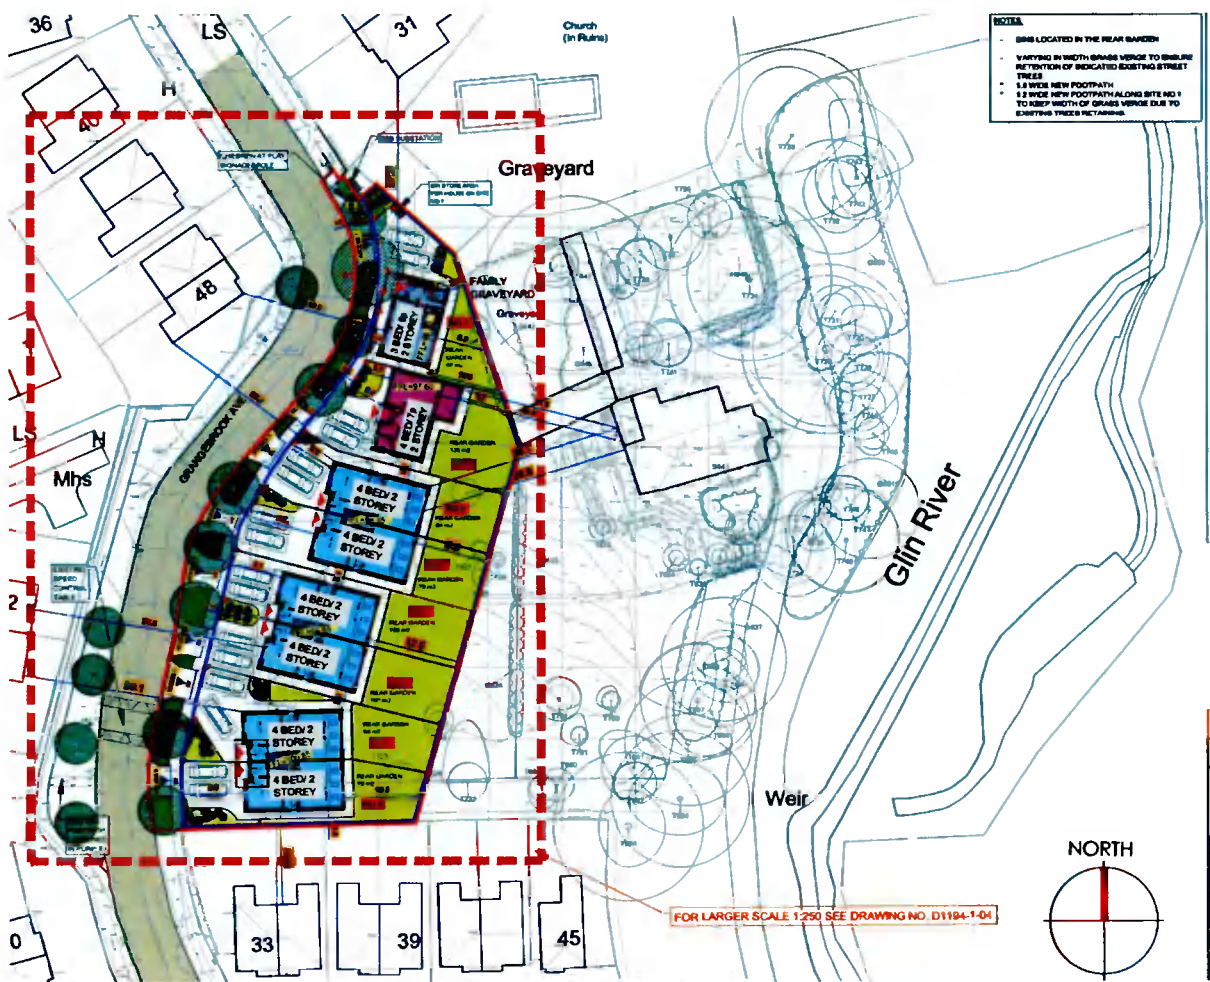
Layout of 8 No. New Houses, showing their relationship to Whitechurch Church and Palmyra
